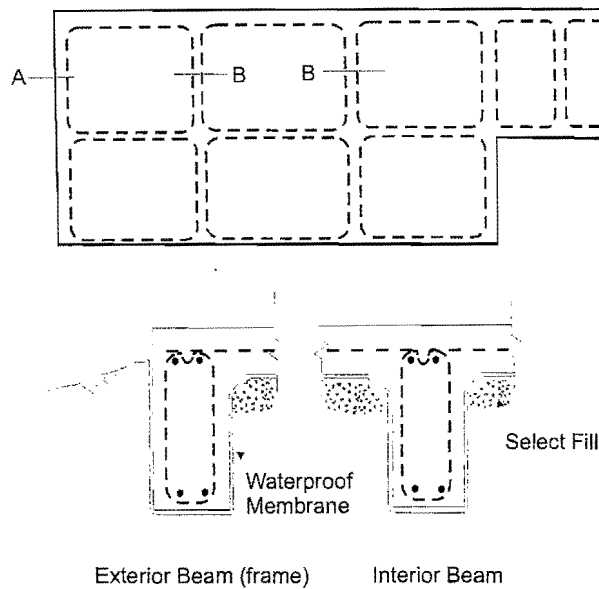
Typical layout for a drilled pile and grade beam foundation system (Nelson and Miller, 1992)
